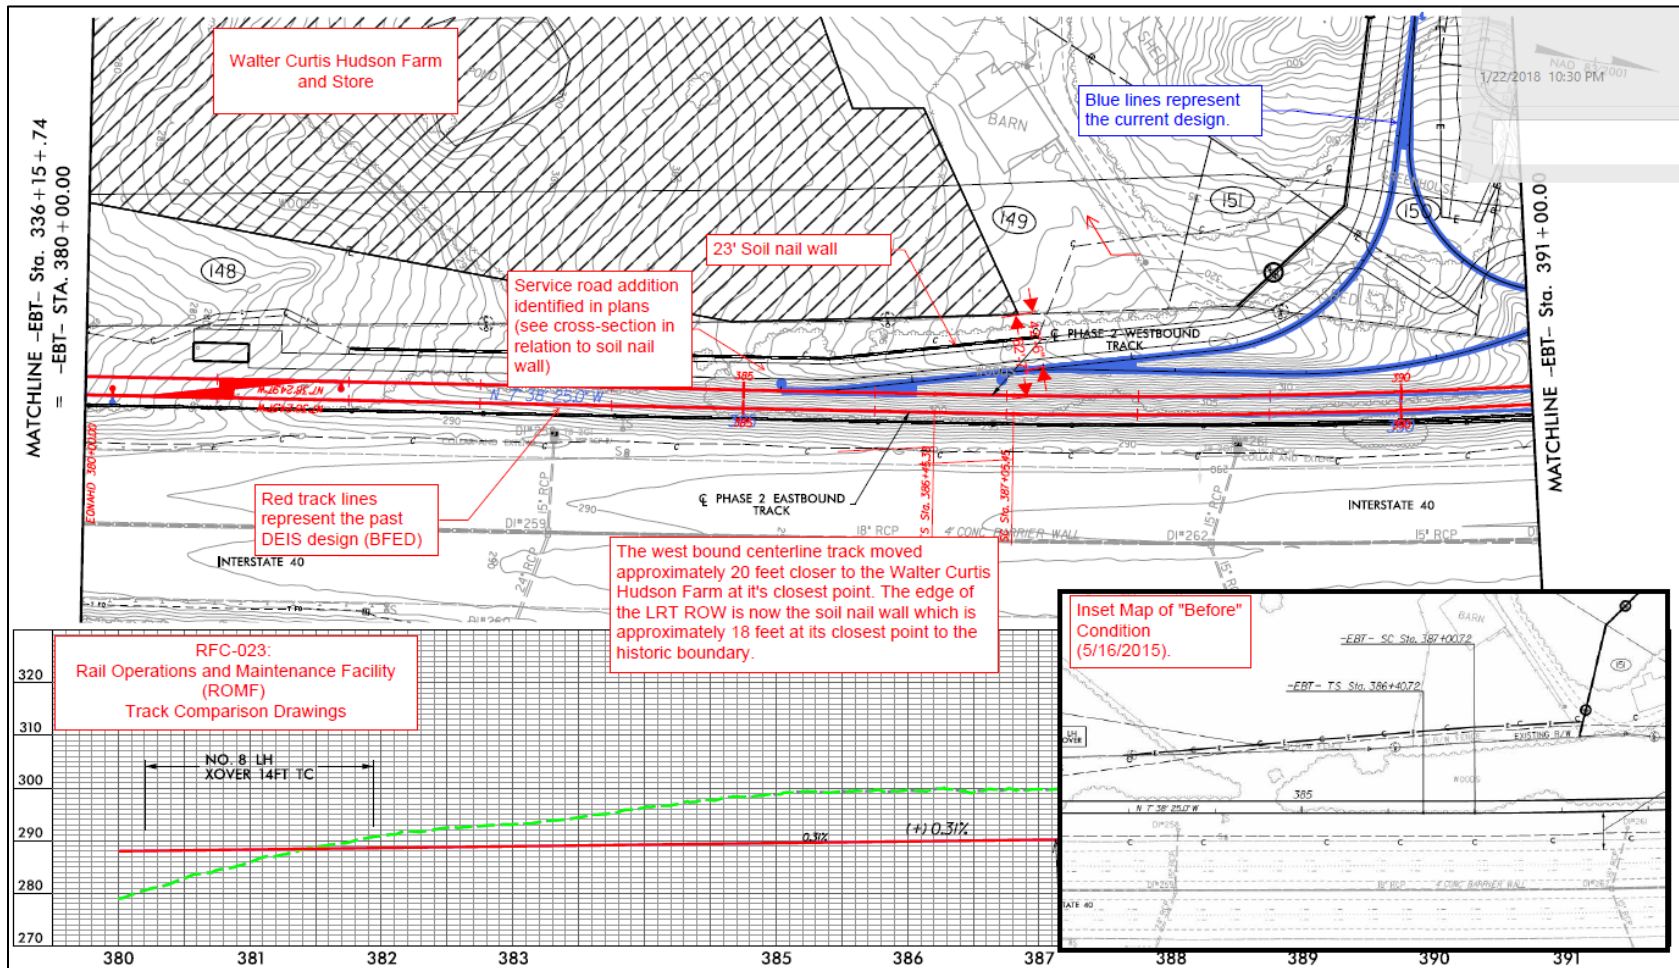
Walter Curtis Hudson Farm and Store, proposed project plans
